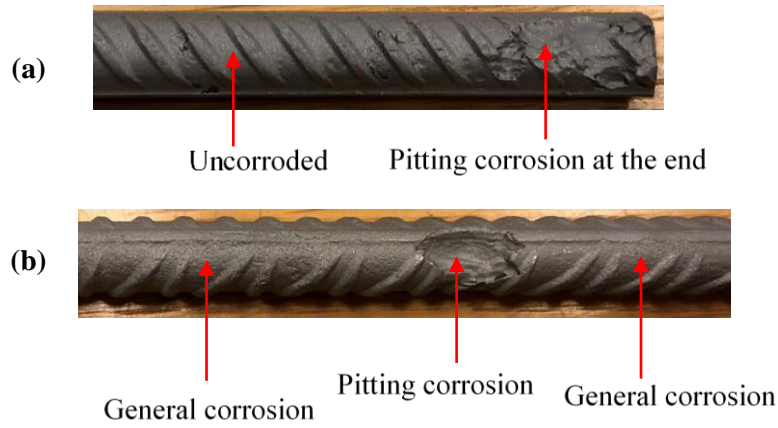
Corrosion pictures: (a) pitting at the end; (b) general corrosion and pitting corrosion.
